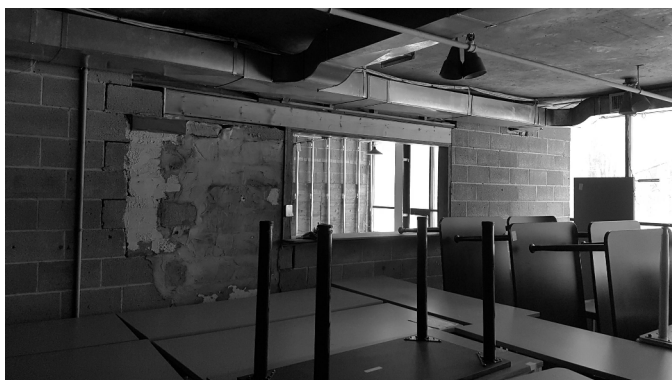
PARTIALLY DEMOLISH EXISTING WALL AND WALL OPENING
